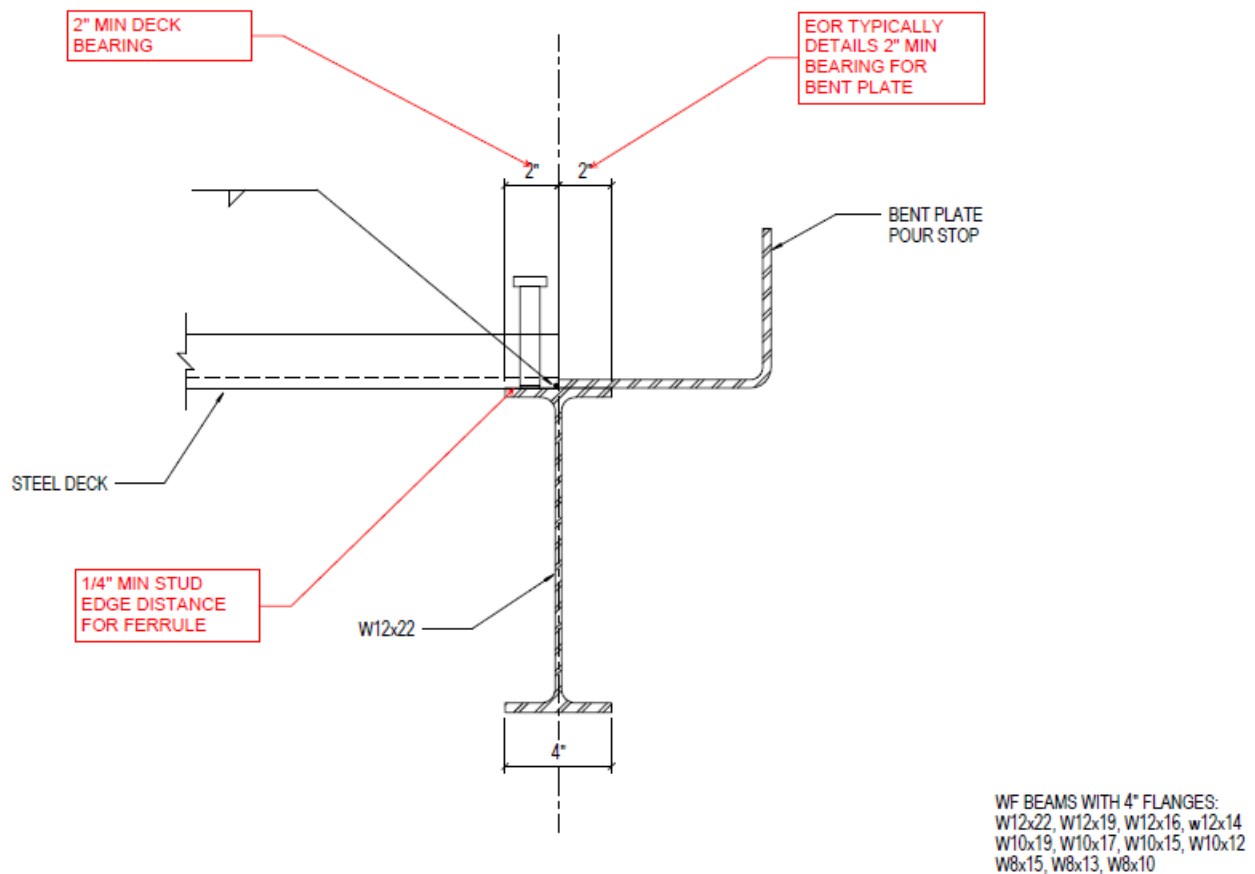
Deck Bearing at Composite Perimeter Beam - As Detailed
